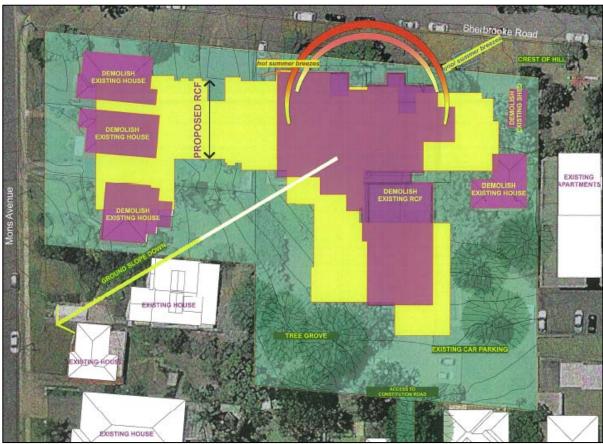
Site analysis plan: Existing buildings in purple - proposed building footprint in lime green
